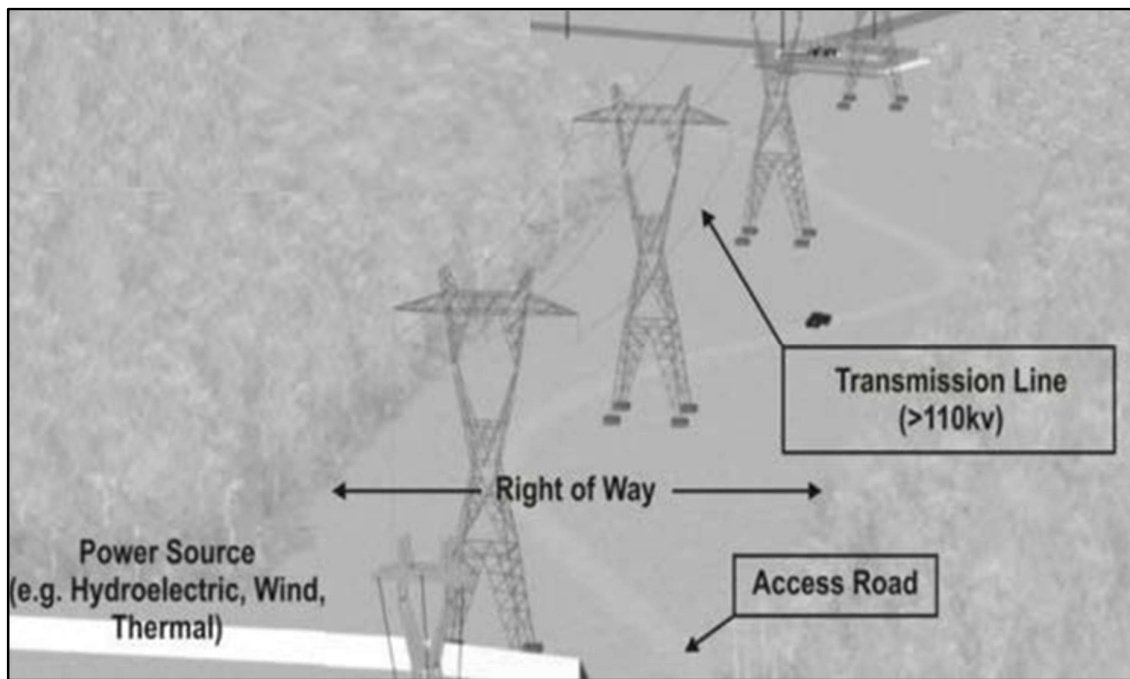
Right of Way and Access Road for OHTL (IFC, 2007)
